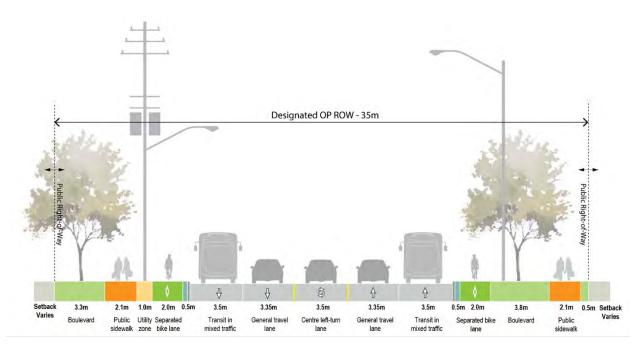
Preferred ROW Alternative (Segment 2A: Southdown Road to CN Railway Crossing)
